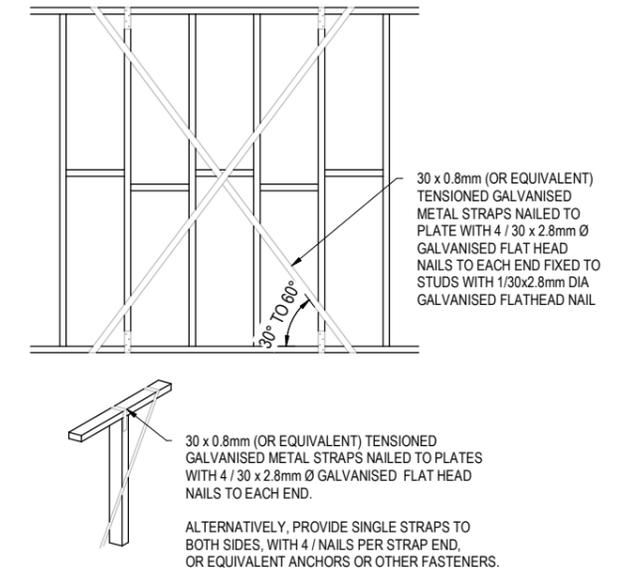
AS1684.2 BRACING TYPE (C) TABLE 8.18
